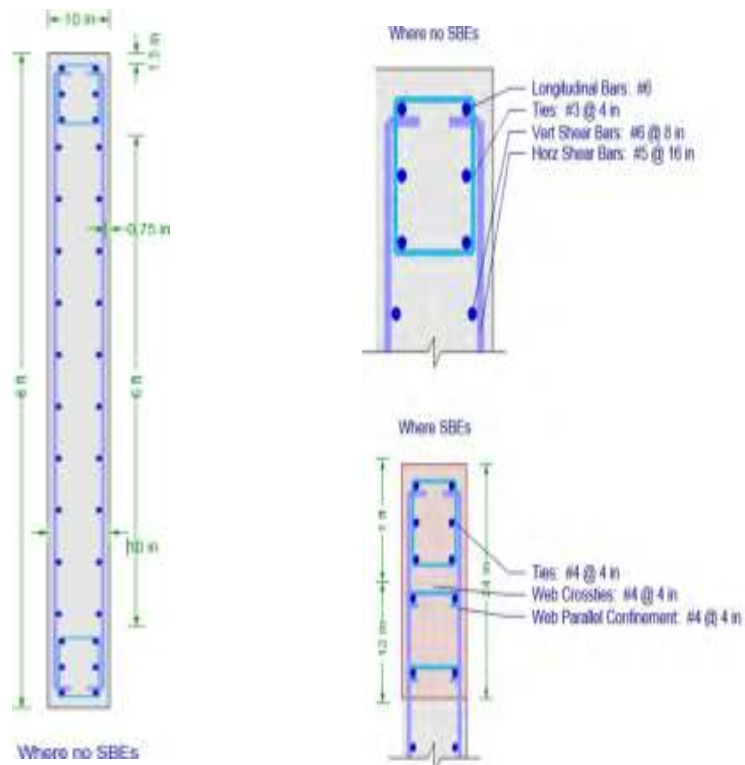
Building (B3-6S-L-S) Special RC Shear Reinforcement Details; Wall Section for Floors 1-3
